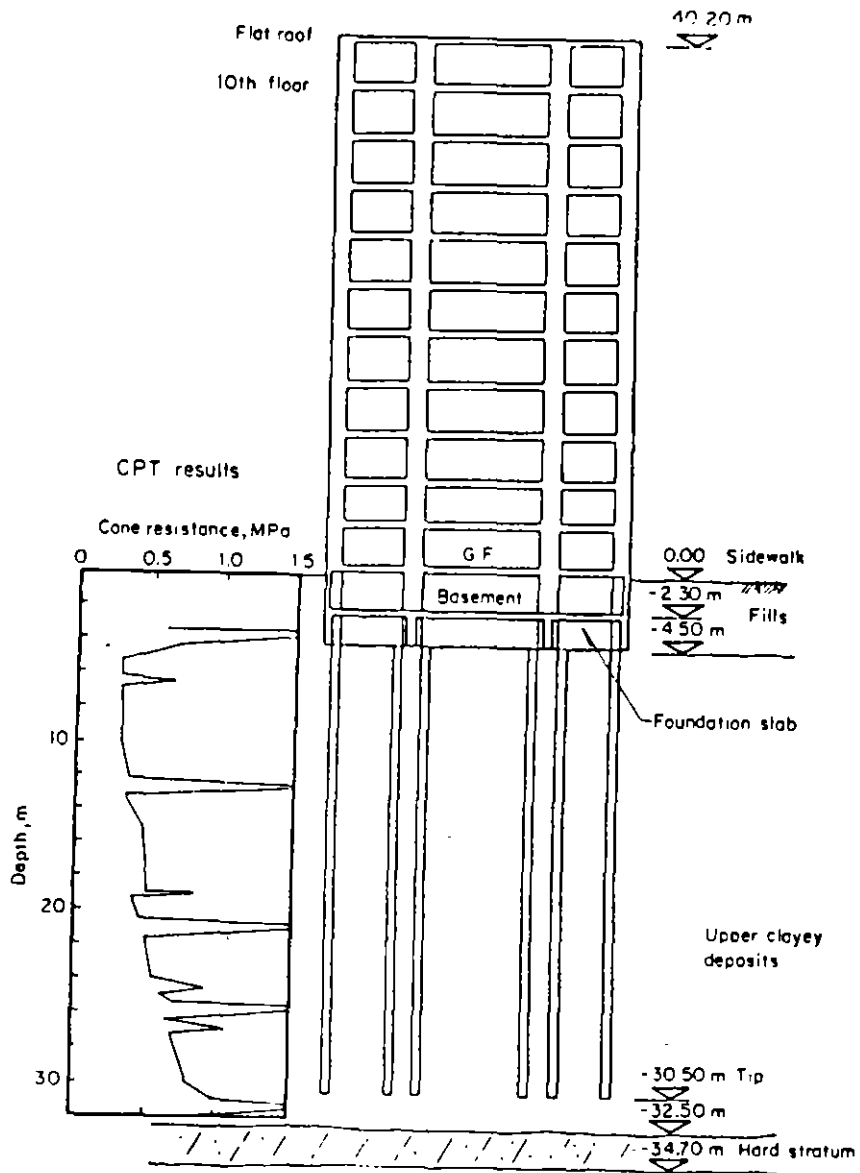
Elevation of the Building IV including foundation and geotechnical conditions.
